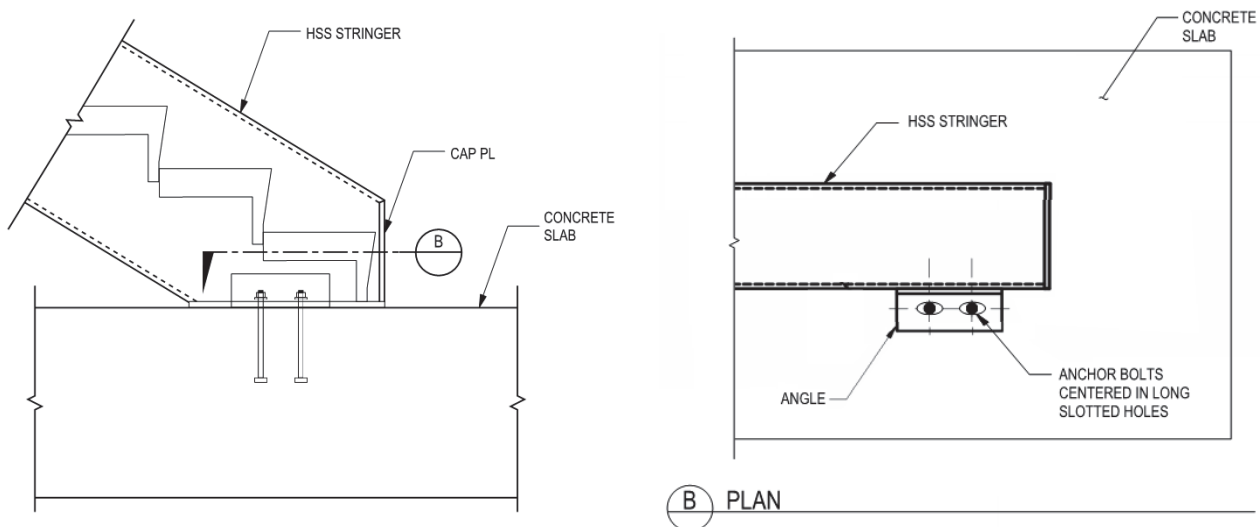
Examples of Slip Connections at Base of Stair – Longitudinal Direction
